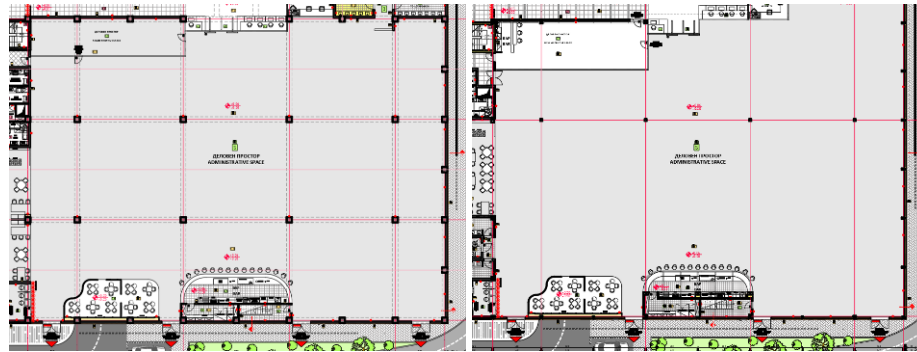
Comparison of both structural systems in floor plan: old structural system with reinforced concrete columns on the left and new structural system with steel columns on the right
